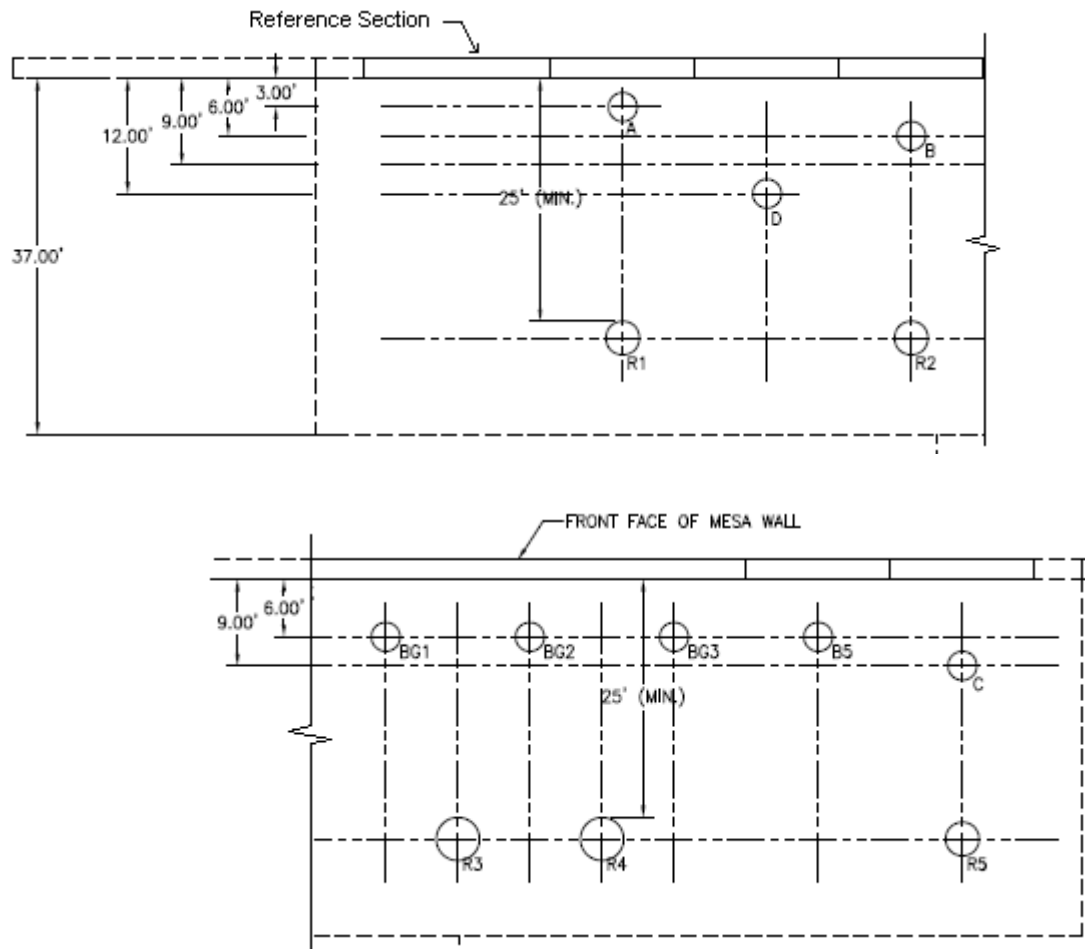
Plan view of MSE test wall and shafts (Tensar, 2007)
